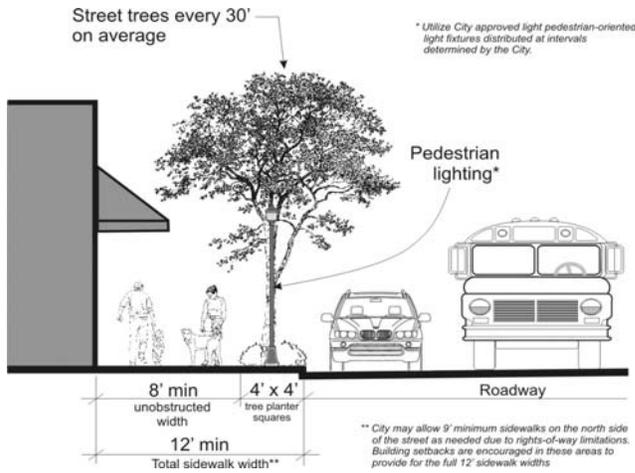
Minimum sidewalk standards for designated Storefront Streets.
